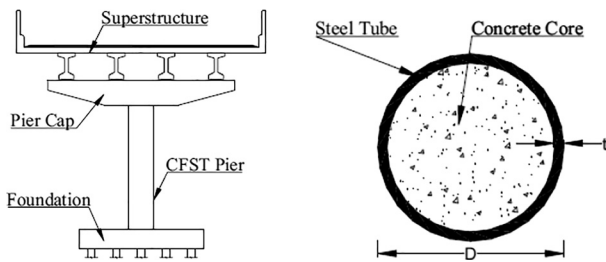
Cross-section of the concrete-filled steel tube of a bridge pier
